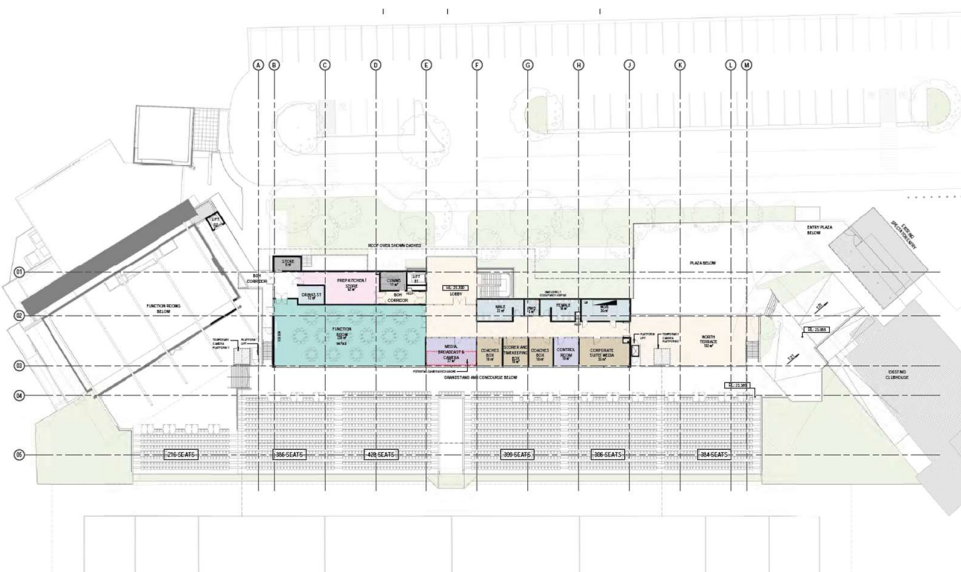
Proposed First Floor Level Layout (Source: Blight Rayner, 2026)
